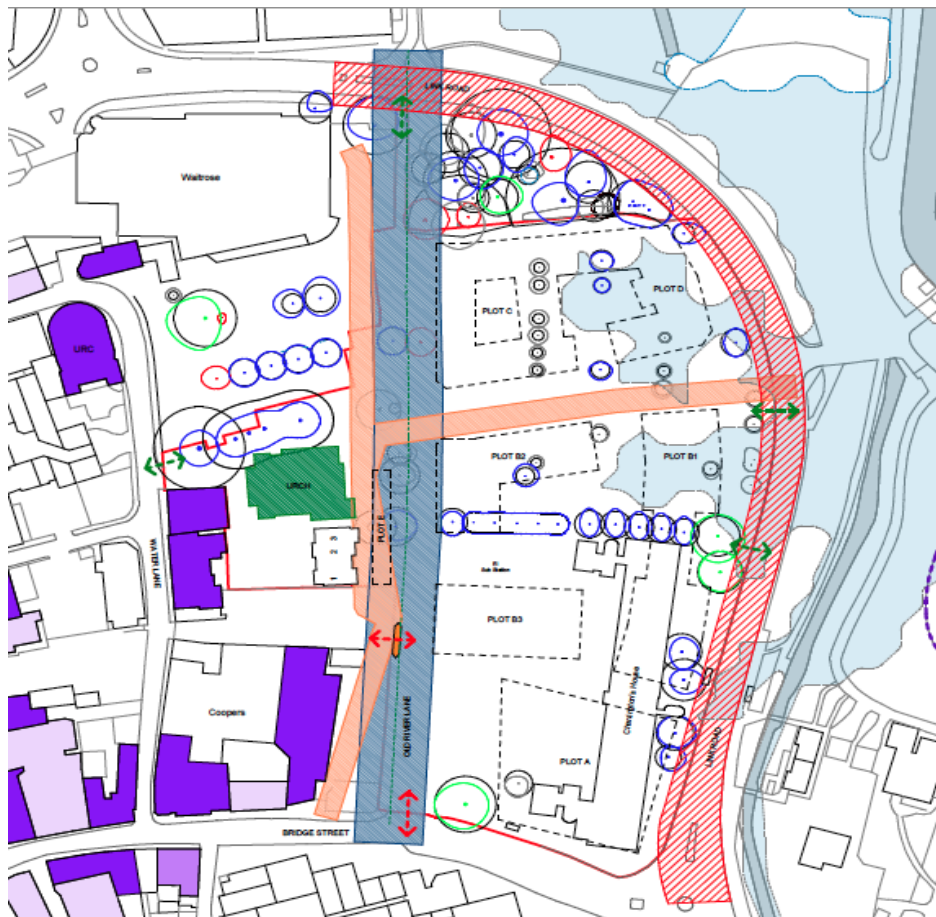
This plan (from Cityheart documents) shows the site constraints, including the 8m underground river culvert. Note that the building outline encroaches this.
